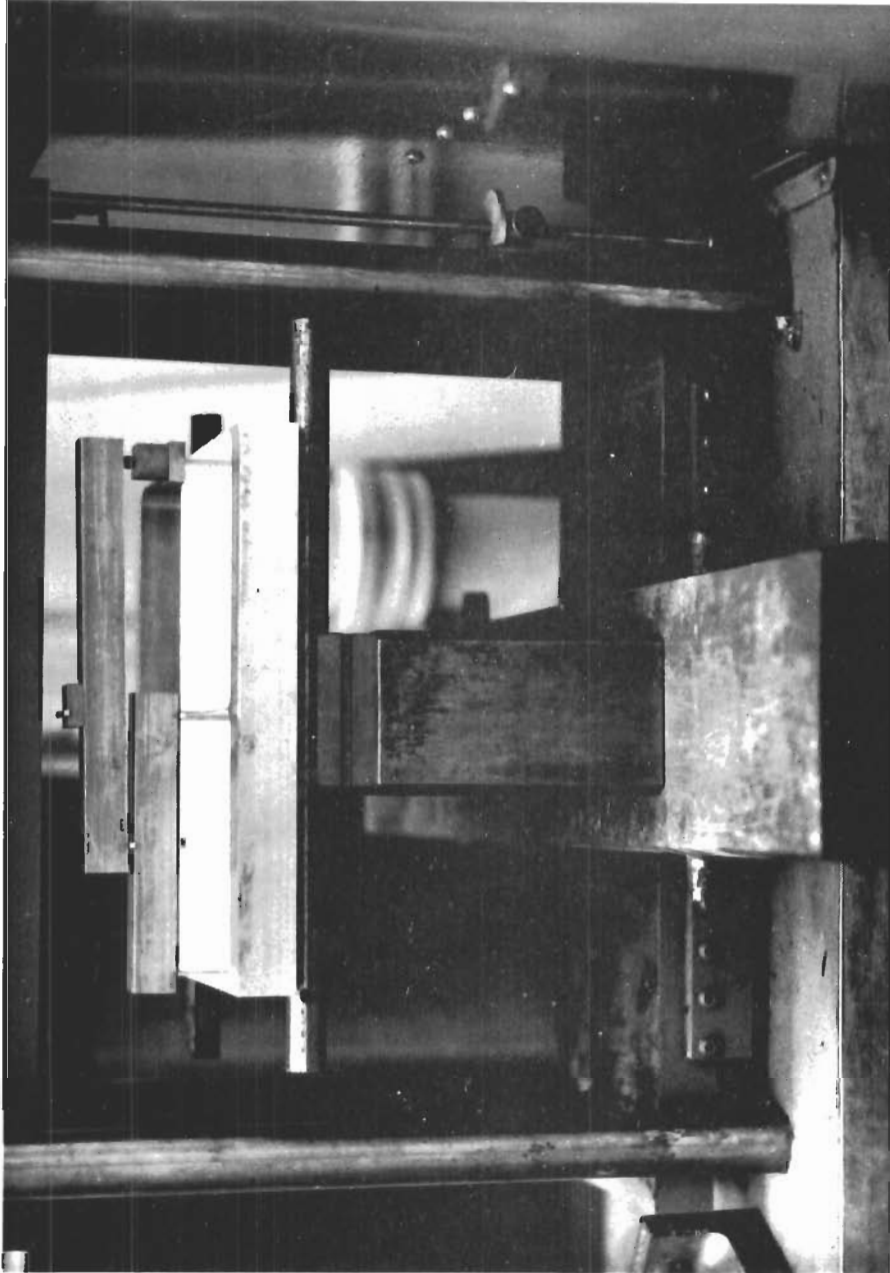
Stiffened Plate No. 3, Transverse Load Test.
